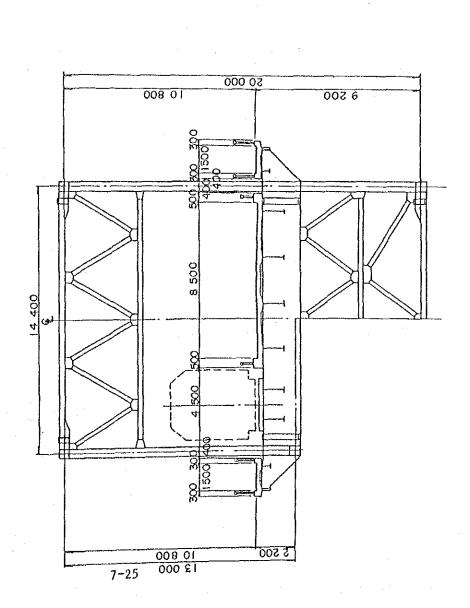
ROADWAY AND RAILWAY
